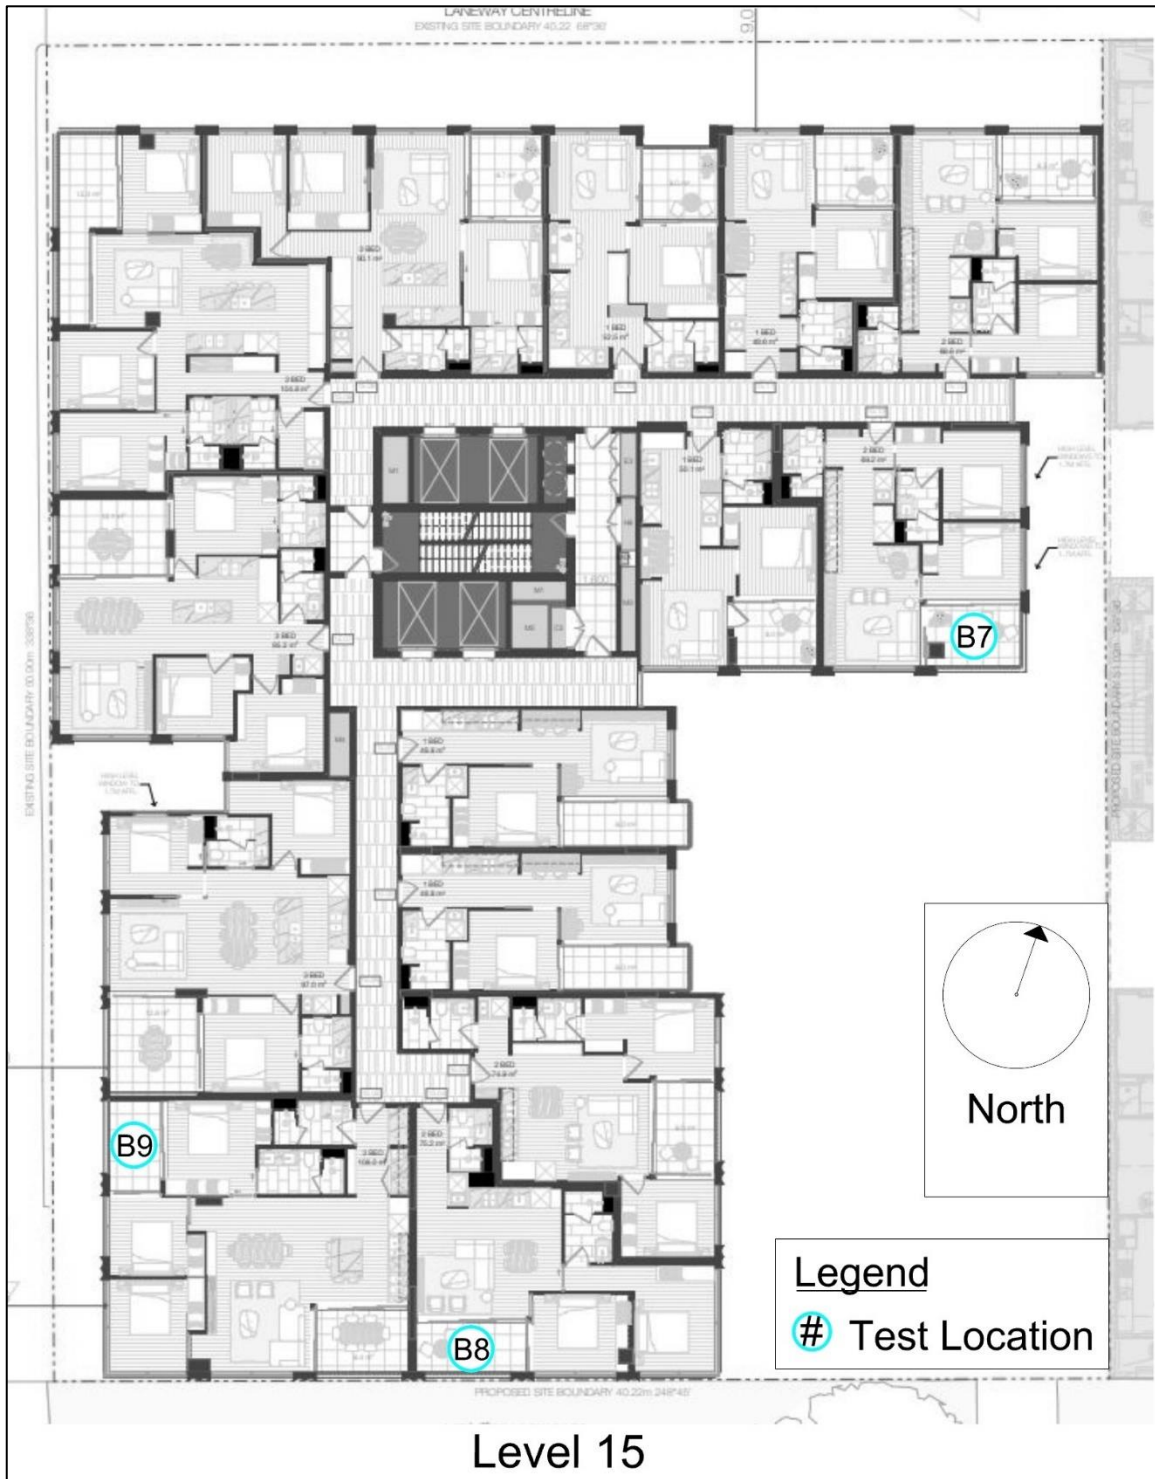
Test Locations on Level 15 of the proposed 60-70 Park Street development.
